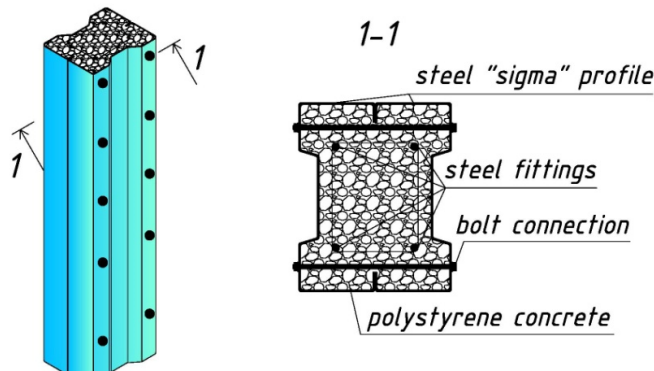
Lightweight reinforced concrete column using LSTC: a) general view; b) cross-section
